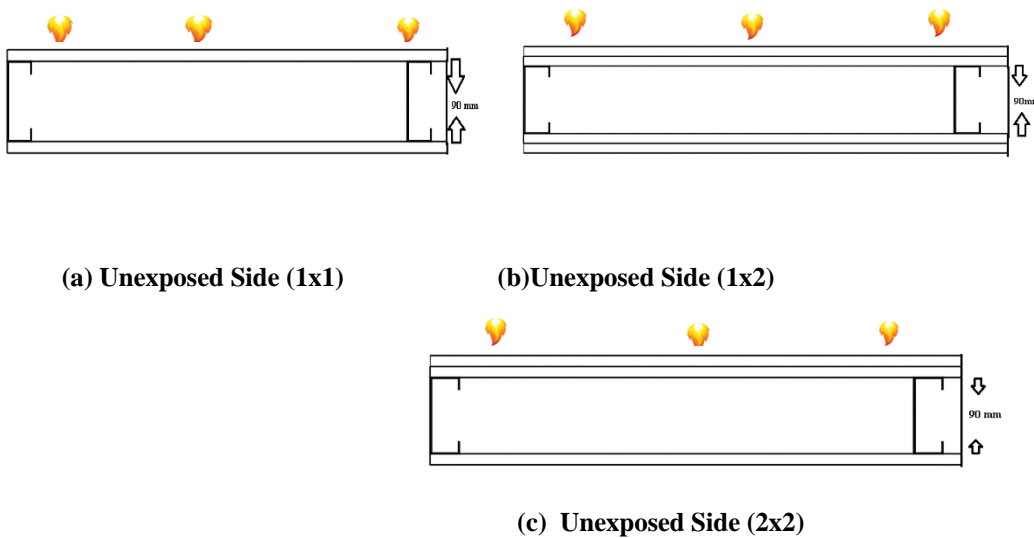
Fire Resistance of Typical Floors, Walls and Partitions Comprising Cold-formed Steel Sections and Planar Board Protection, and Heated from One Side Only [84,5] .
